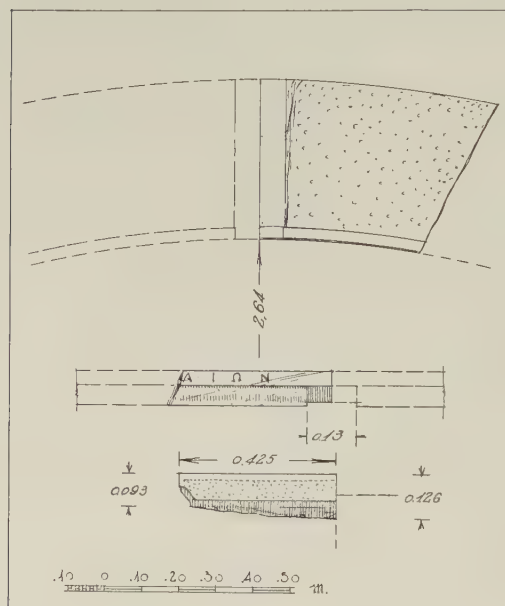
(I 638) Marble Bench from New Bouleuterion (?); Plan of Underside, Front and End Elevations
